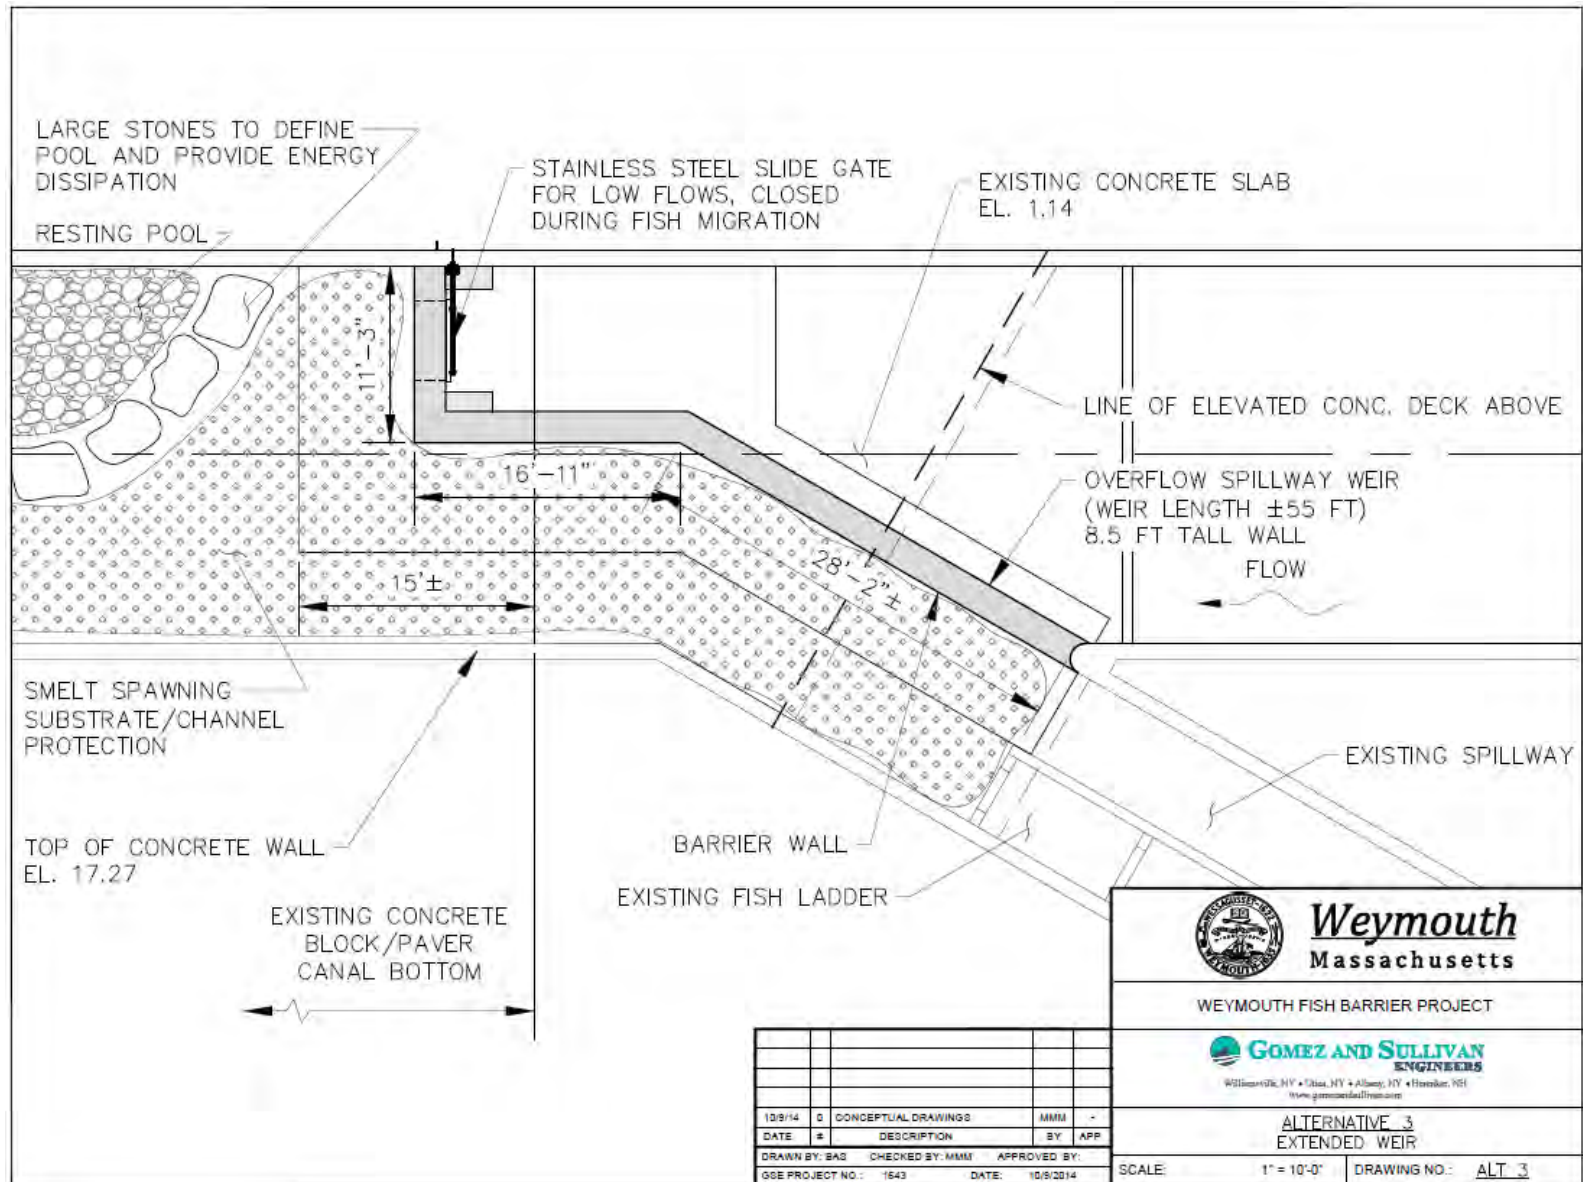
Concept Design Alternative #3 – Extended Weir
